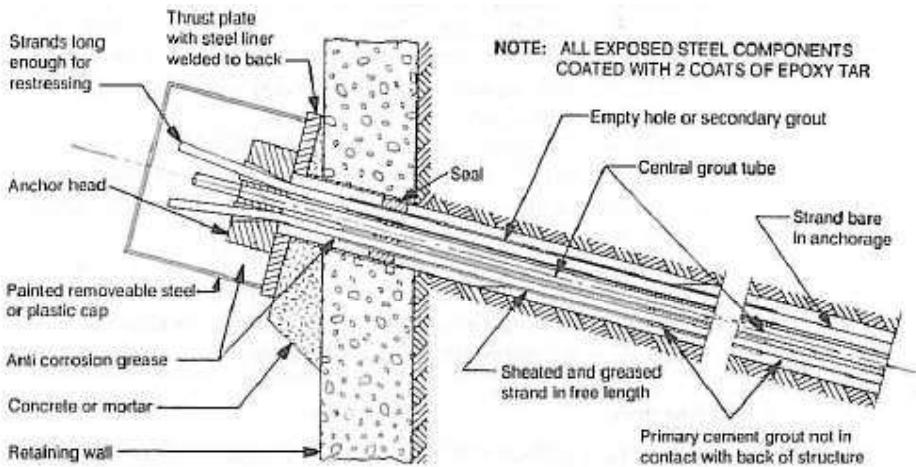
Typical detail for restressable permanent strand anchors (SAICE code of practice, ref 8)
